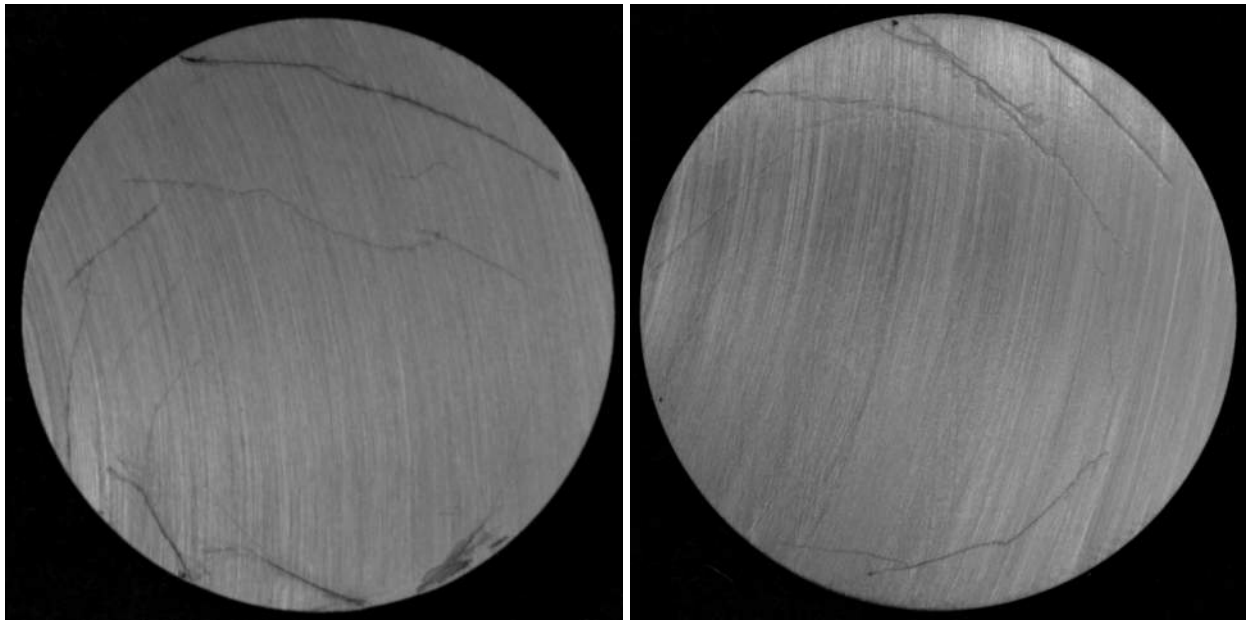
Photo. Transverse cracks in fracture surface sections; Rod 1 (left), Rod 2 (right).
